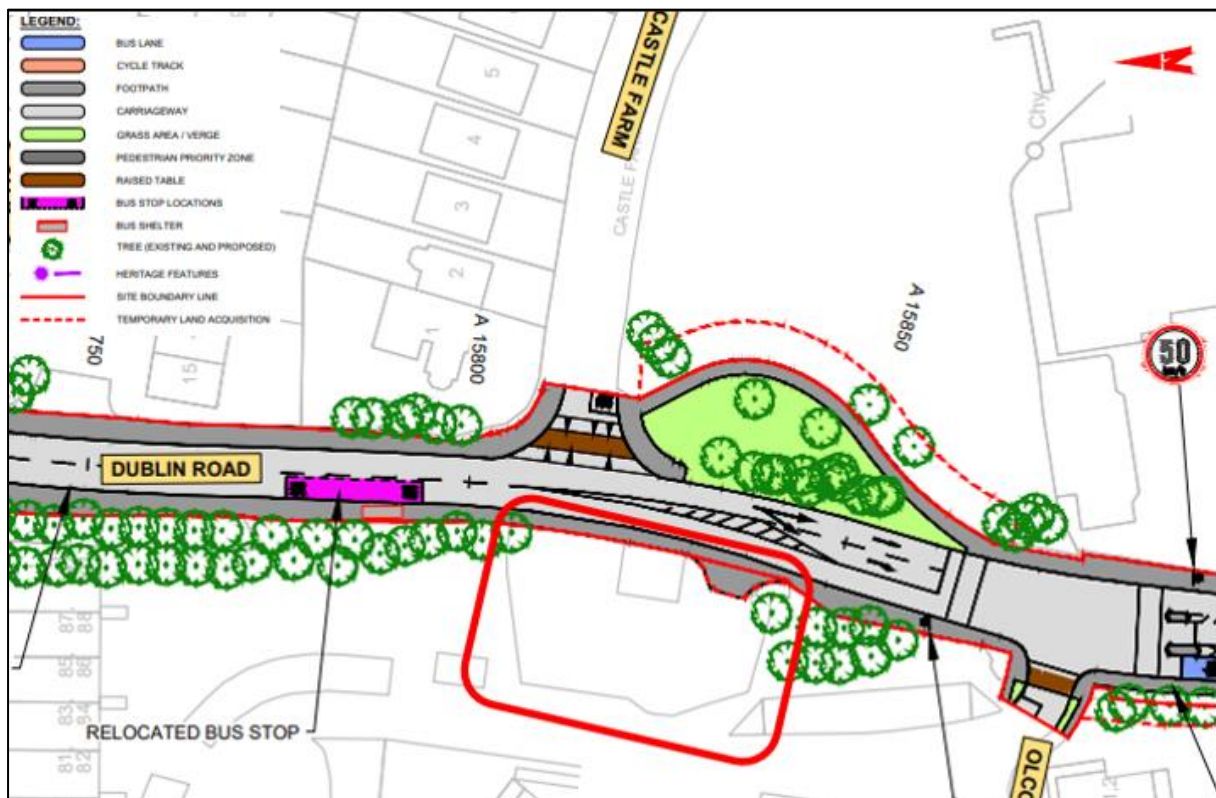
Extract from General Arrangement Drawing at Dublin Road (Sheet 45)
